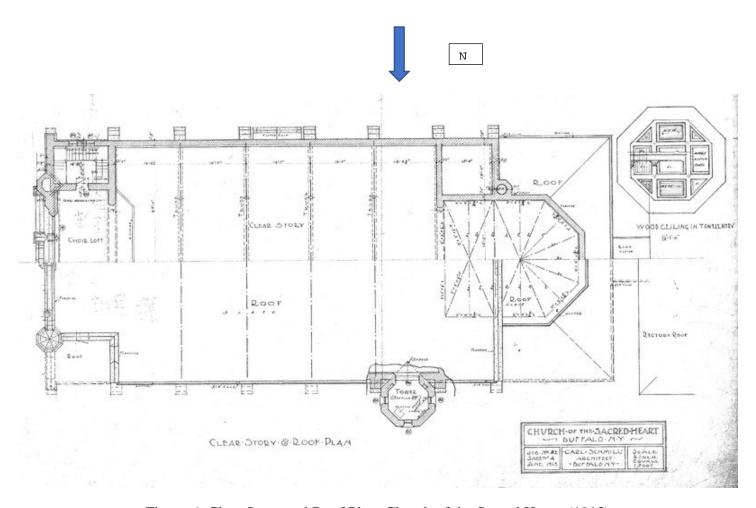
Clear Story and Roof Plan, Church of the Sacred Heart (1913)
